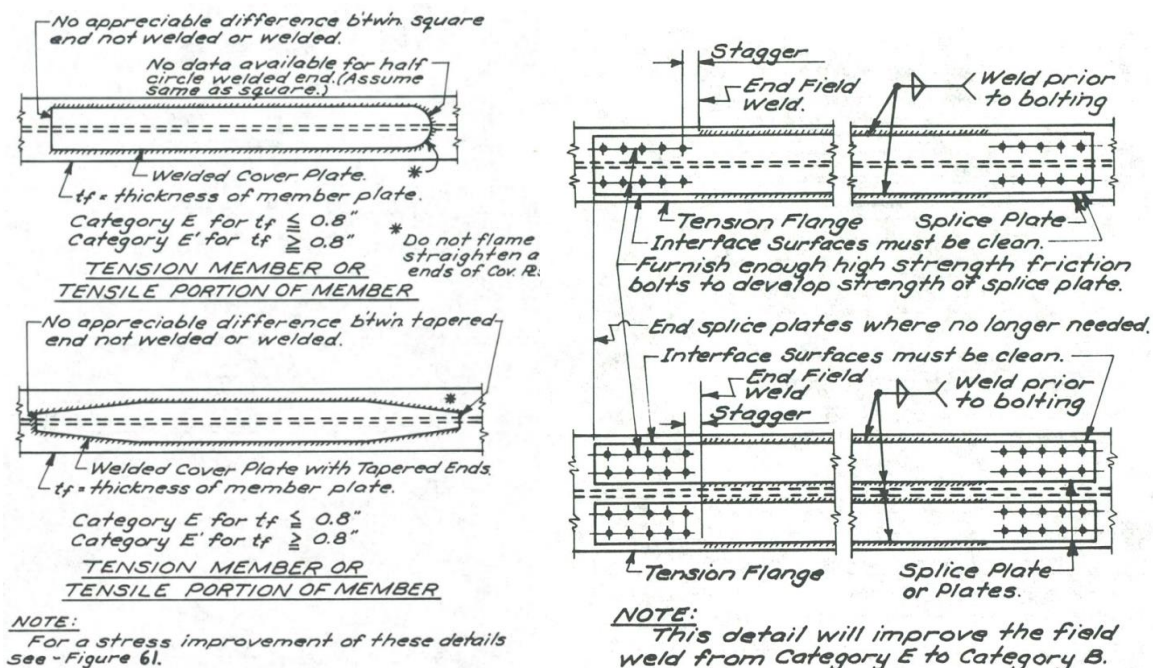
Details of repair using steel plates with welding (left), and combination of welding and bolting (right) (Shanafelt et al. 1984).
